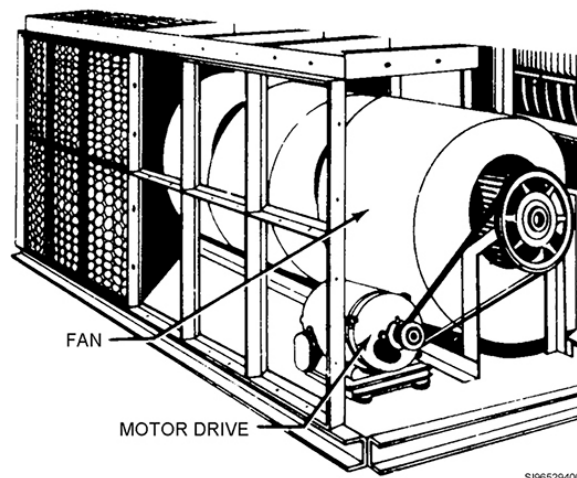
Belt driven blower assembly with motor mounted on floor.
